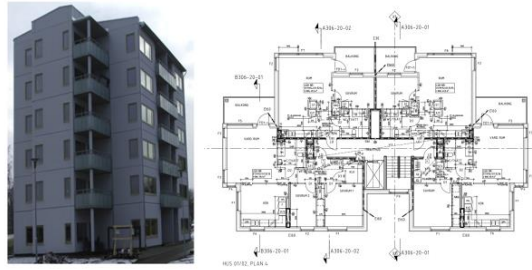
Photograph (left) and typical floor plan (right) of the modelled building.
